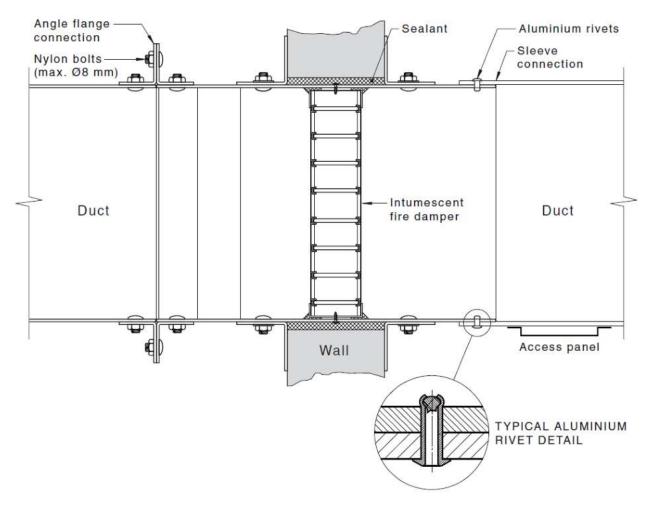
Intumescent Fire Damper - Raw Edge Connection
